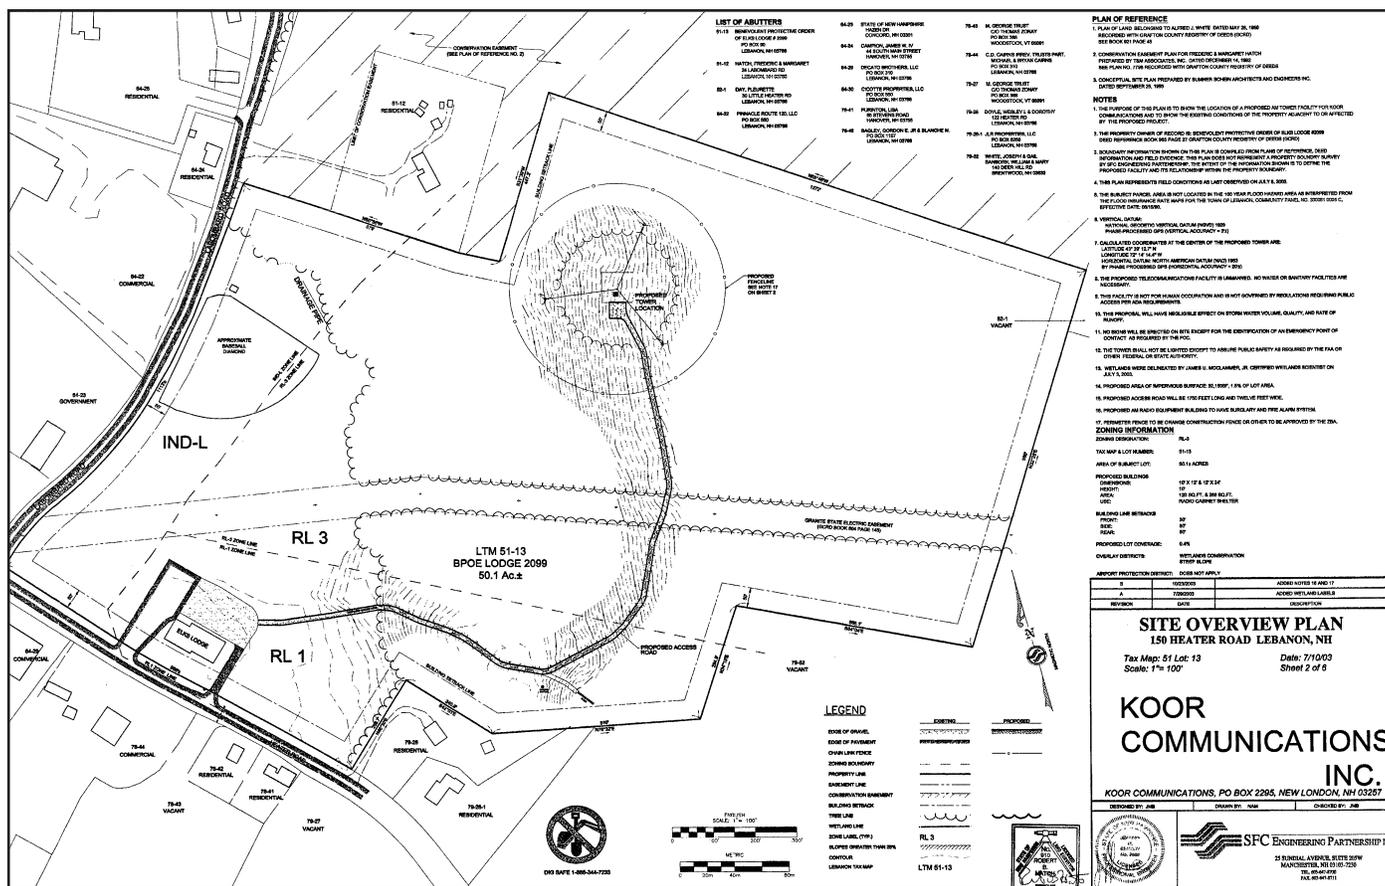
Typical Detailed Plot Plan for Proposed Tower Site
